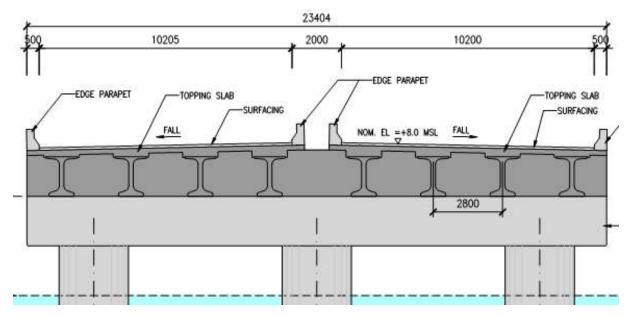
Typical Section of Embankment Viaduct with NU Girder
